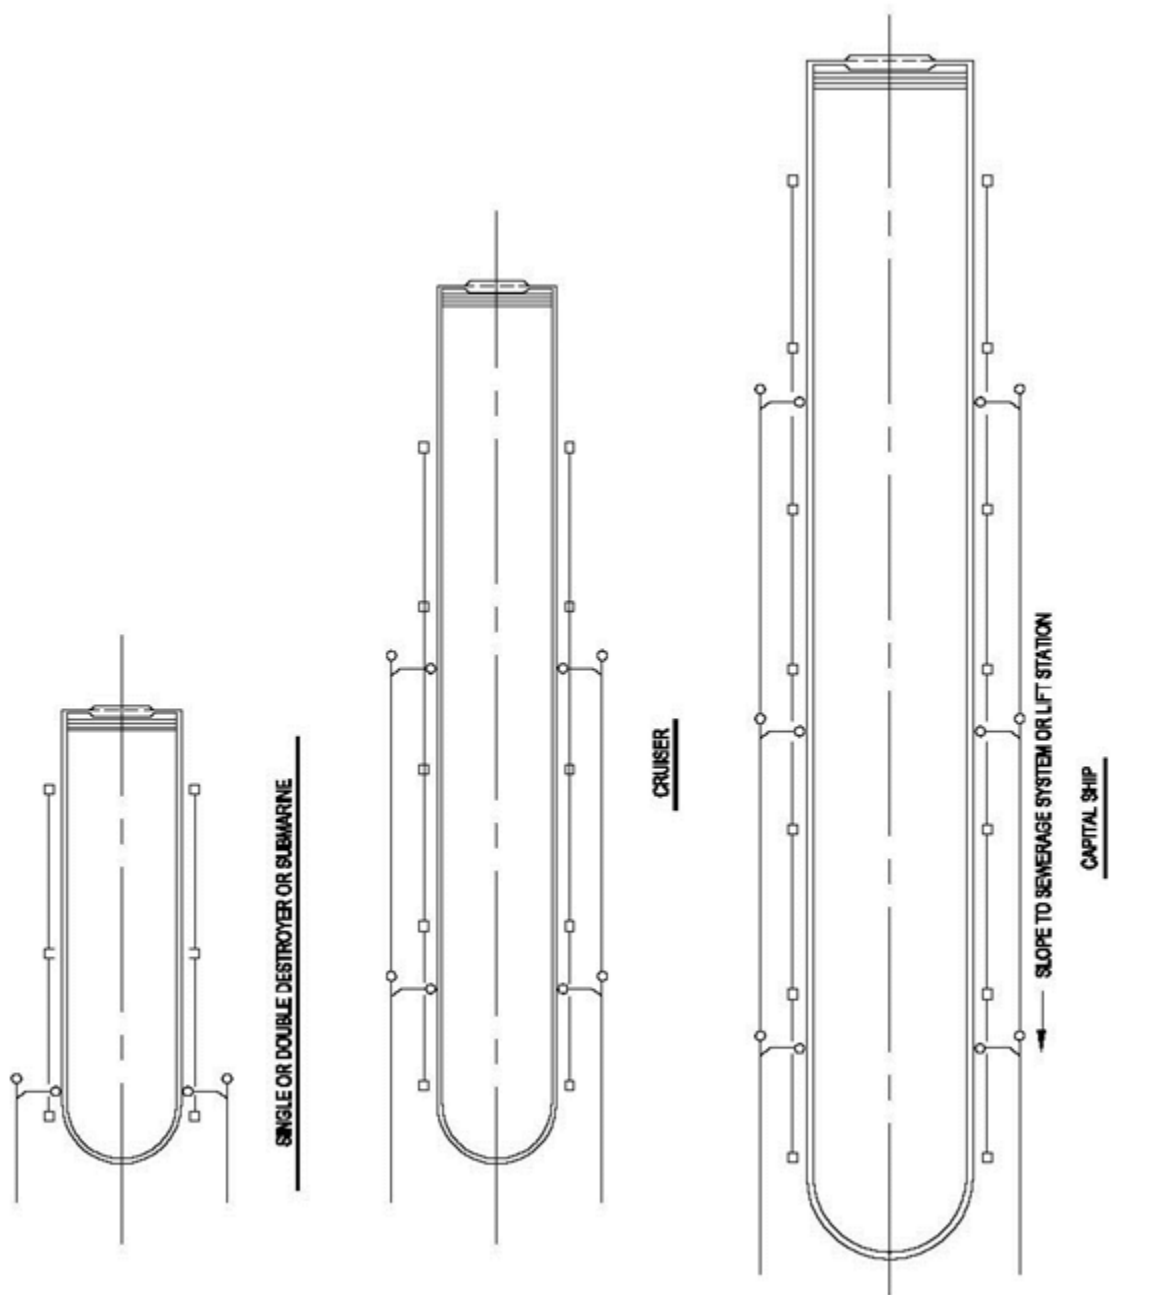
(b) Typical Sewage System Layouts for Dry Dock Facilities (2 of 2)
